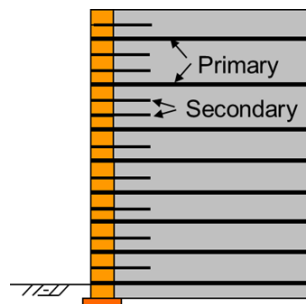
Illustration of geosynthetic-reinforced fill wall with secondary reinforcement
